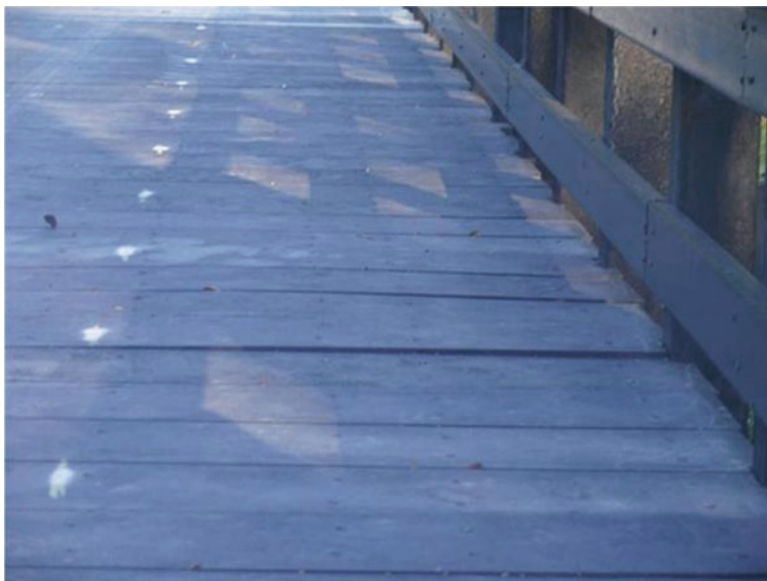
Loosened and dislodged deck boards on bridge T85-19 after the bridge was traversed by a 30 ton steam roller
